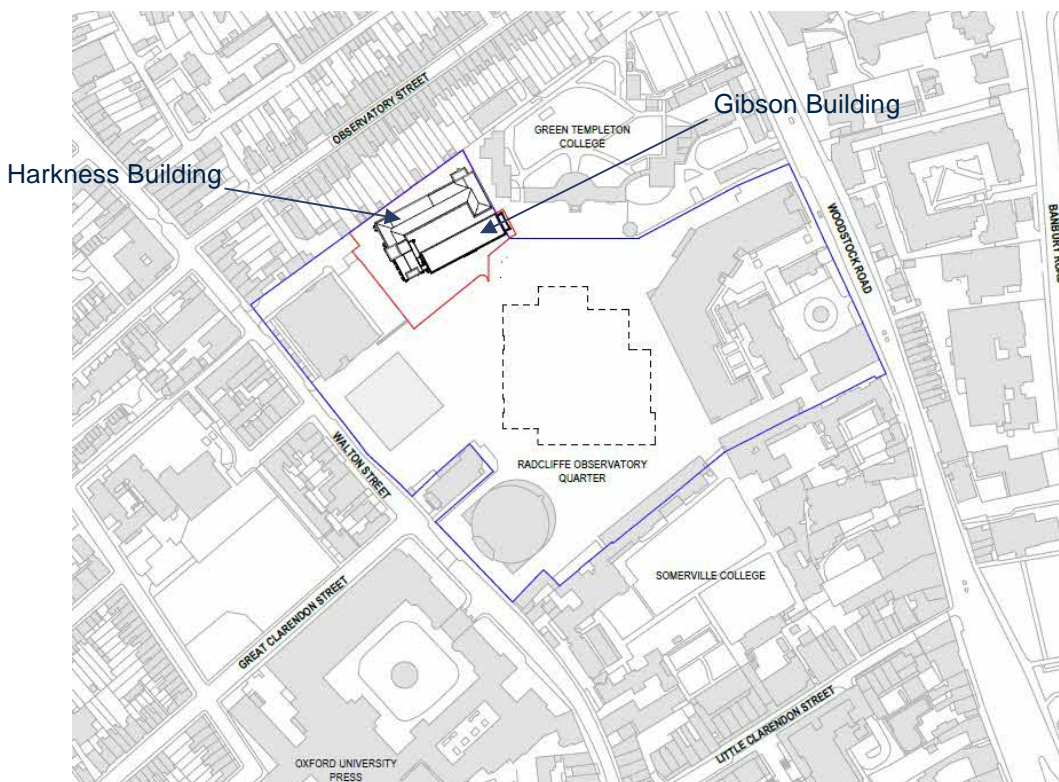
Extract from Site Location Plan drawing no. 598-NBBJ-ZZ-XX-DR-A-001000 (NBBJ)
